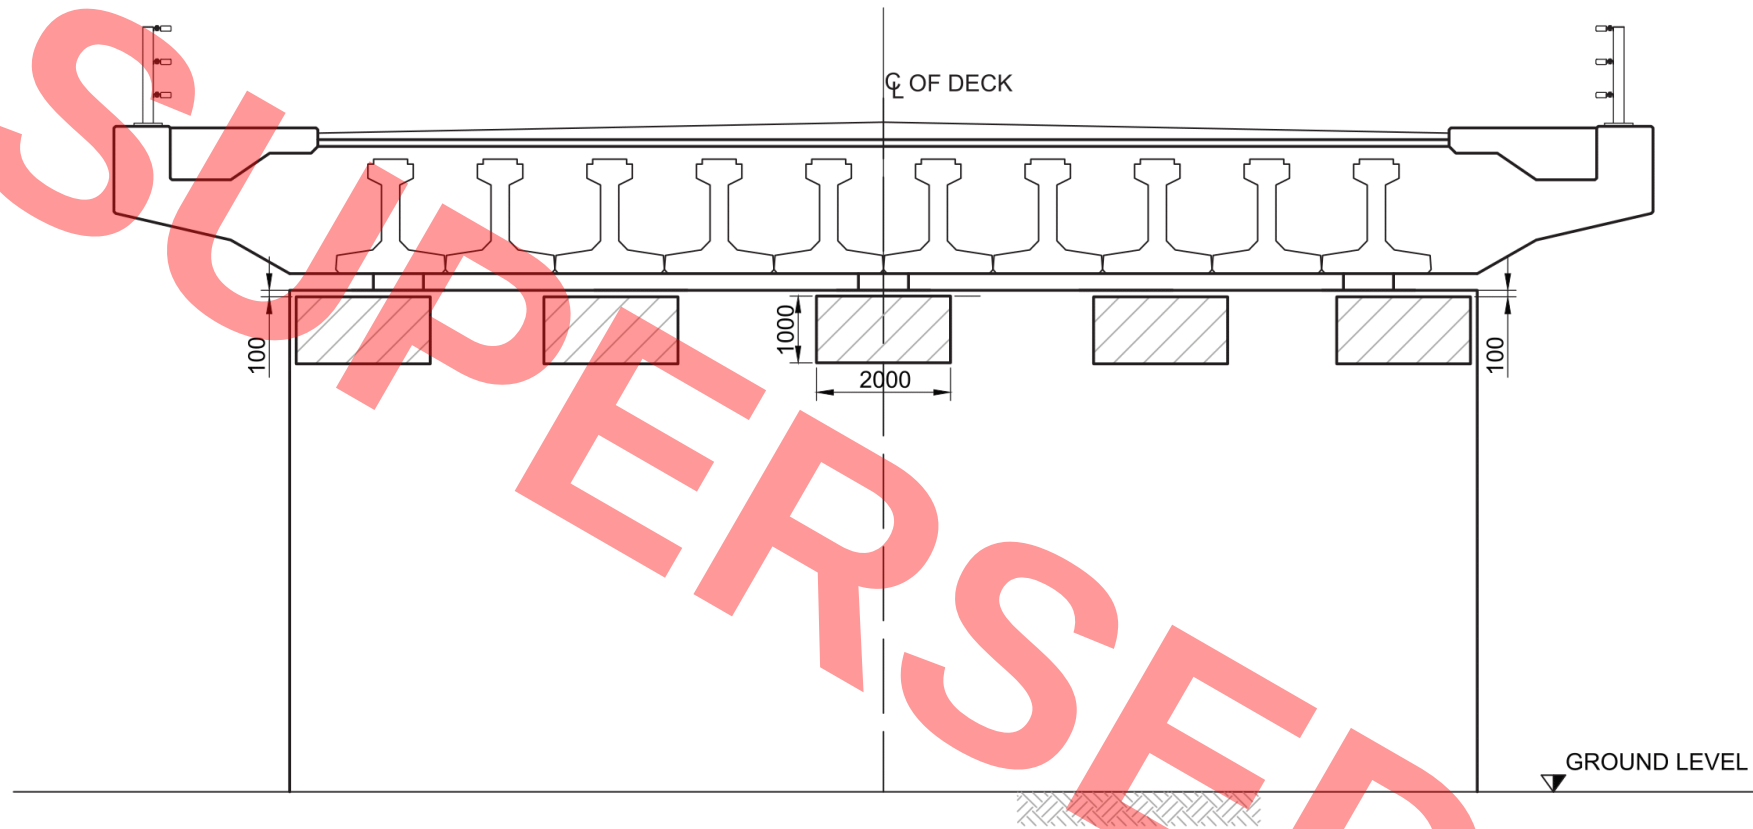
Location of test areas for reinforced piers, columns and crossheads with a deck joint above, bridges >26m wide
